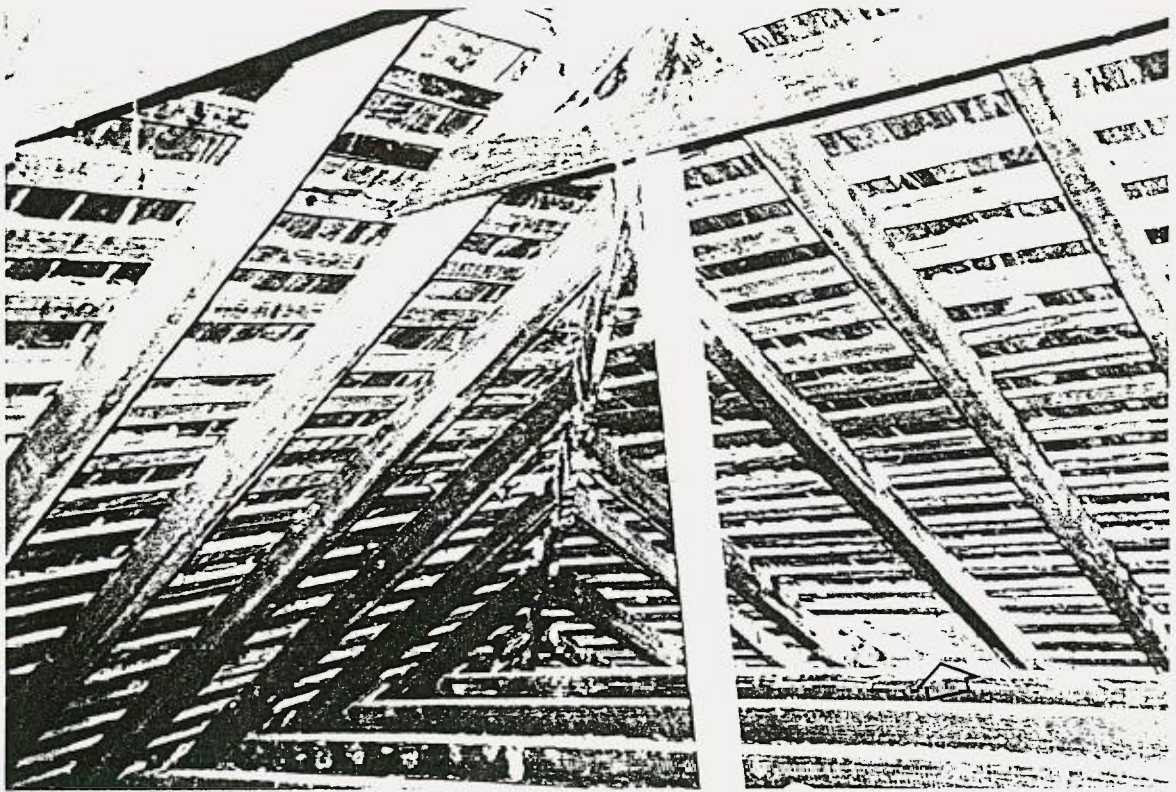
, Roof space. "Minnaville" homestead. Phase 1 cottage, showing ridge piece and hipped rafters still present within roof, south of central chimney.
